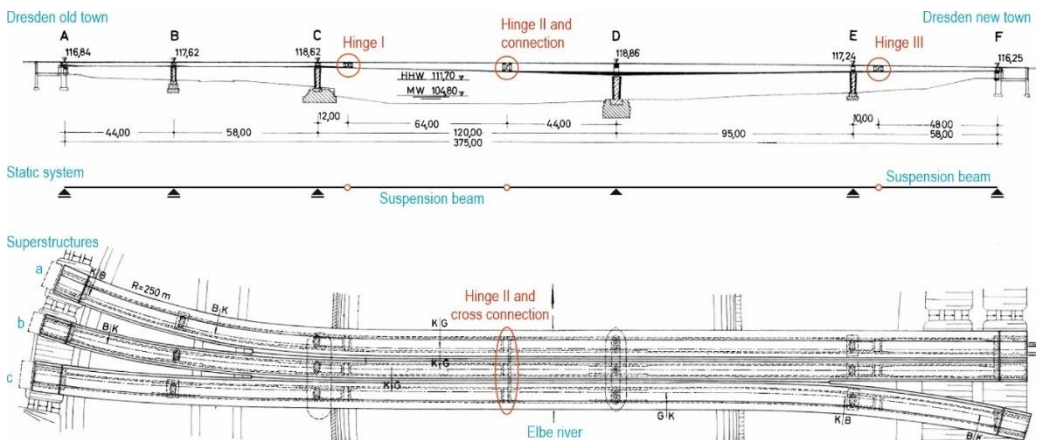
Longitudinal section, static system and ground plan of the Carola Bridge, left: Dresden old town, right: Dresden new town (technical drawings from [12], mod. by Silke Scheerer)
